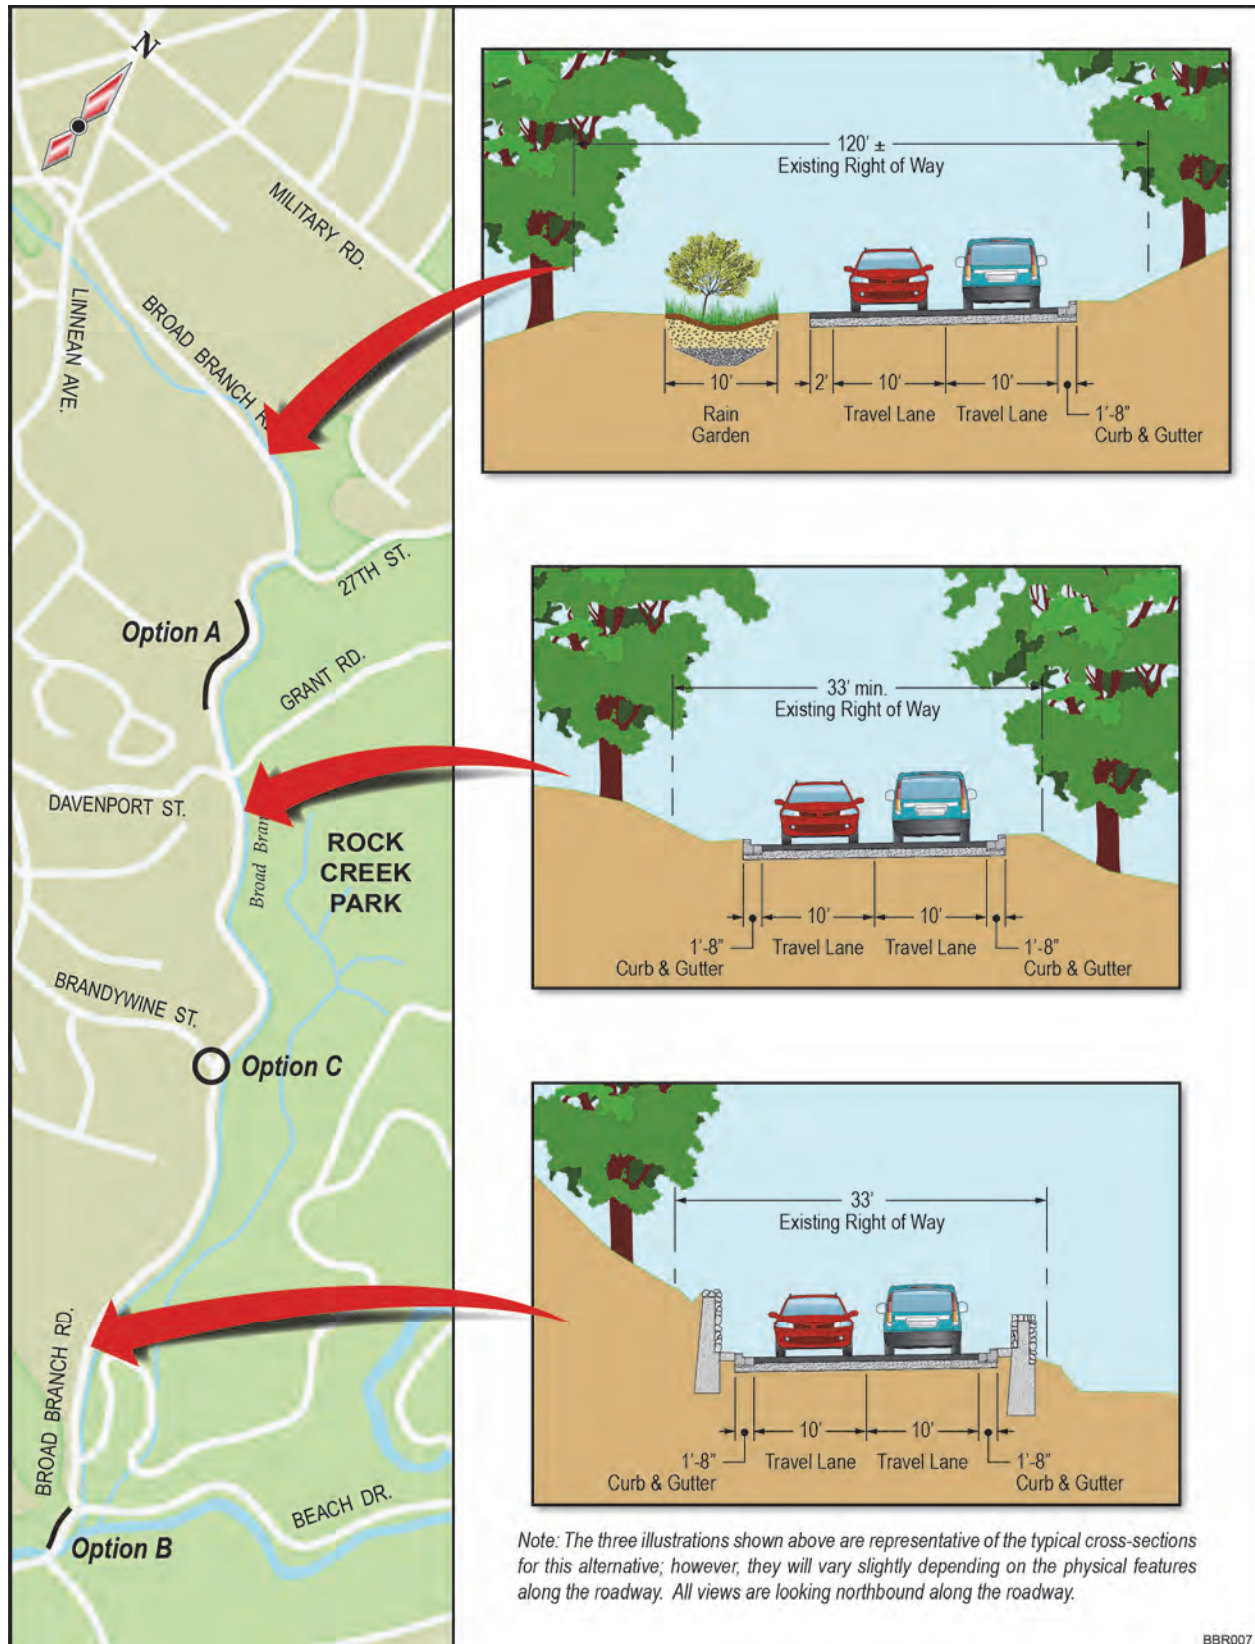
Candidate Build Alternative 2 – Typical Sections
